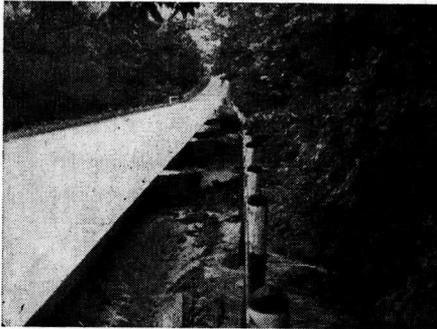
The subgrade of this bridge approach has been partially washed out by a flash flood.
